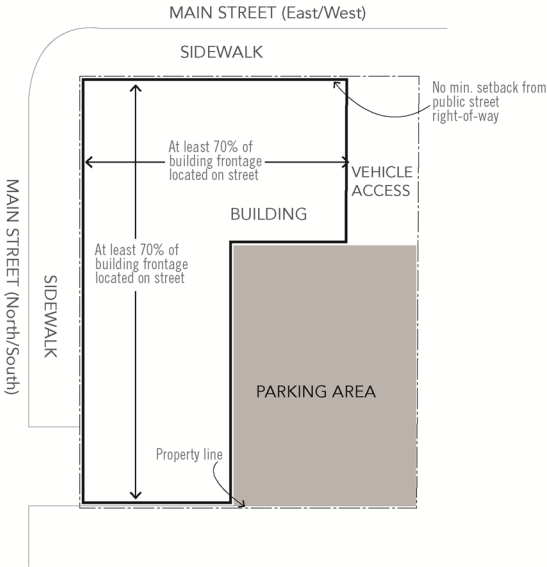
B. Building Placement and Location of Parking, Main Street/Local Street Intersection (typical)
